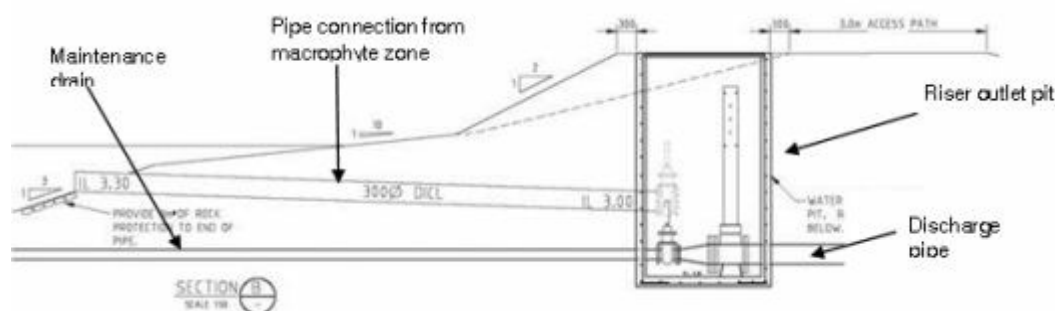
Typical macrophyte zone outlet arrangement
